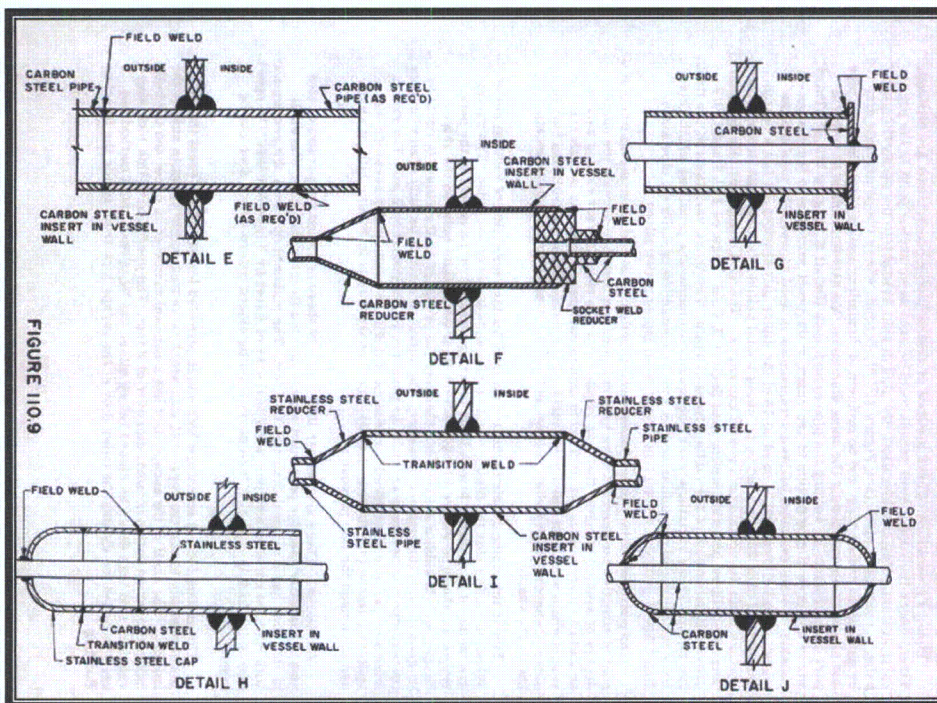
Detail of sealing methods for wall penetrations (Courtesy DECo)
